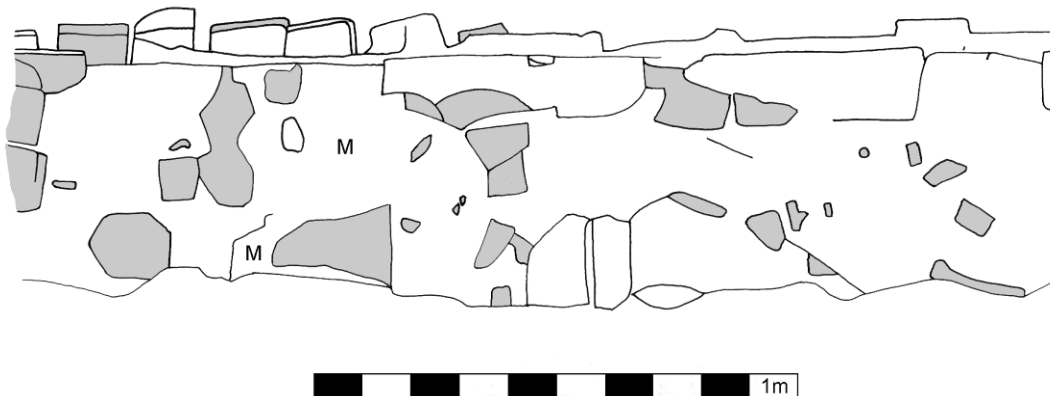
Plan of foundation [CT30]. M = mortar; grey shading = brick.
